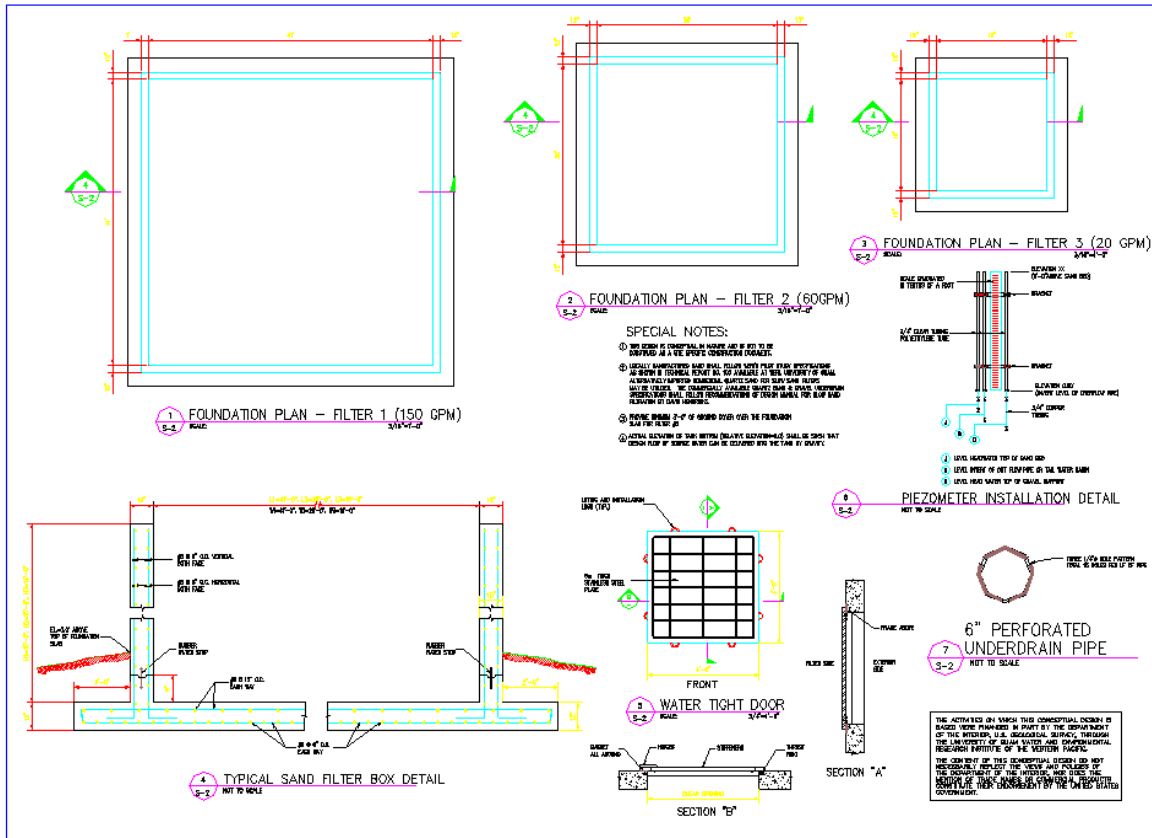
Slow Sand Filter Conceptual Design: Foundation Plan, Filter Box Detail, and Piezometer Installation detail for 150, 60, and 20 gpm filter capacity
